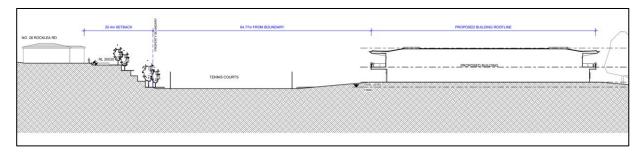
Section through the new pavilion and the adjoining residential property to the north (Source: Application)
